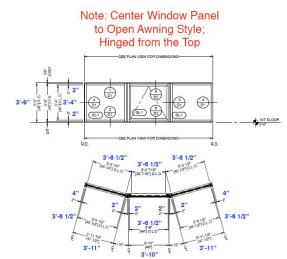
, by applicant showing existing window frame dimensions in blue and proposed frame dimensions in black.
